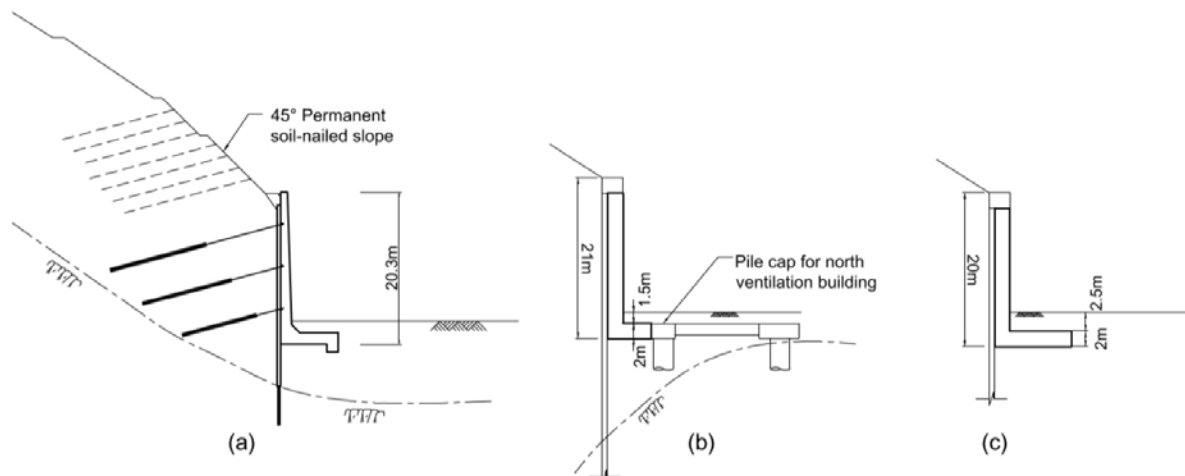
Geometries of completed composite retaining wall (a) Tolo Highway; (b) & (c) The LST construction
